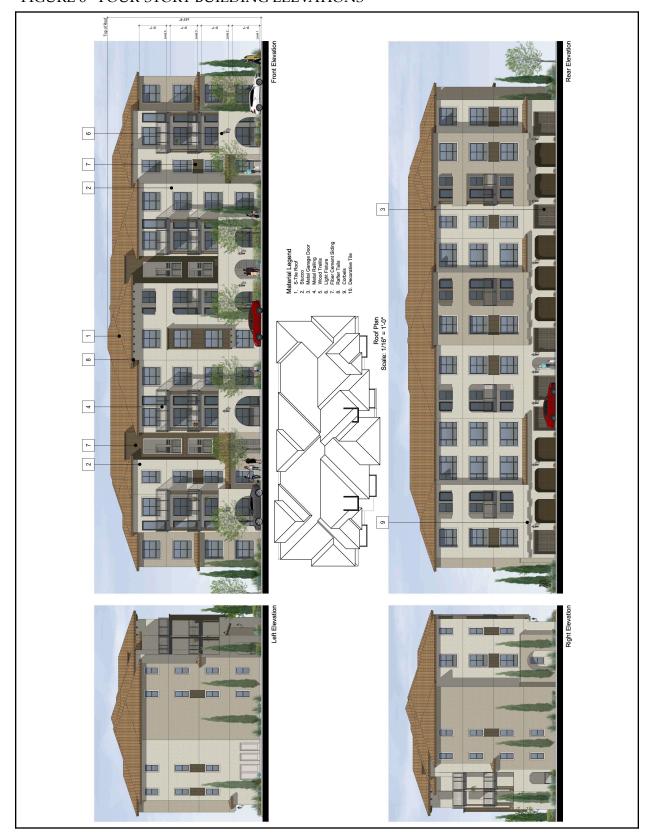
FOUR-STORY BUILDING ELEVATIONS
